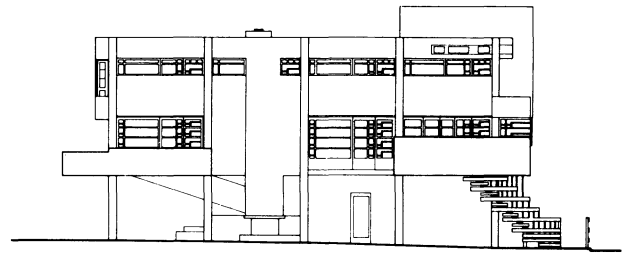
Schindler, Beach House, south elevation (*Oppositions*, 18 [Fall 1979], 68).
